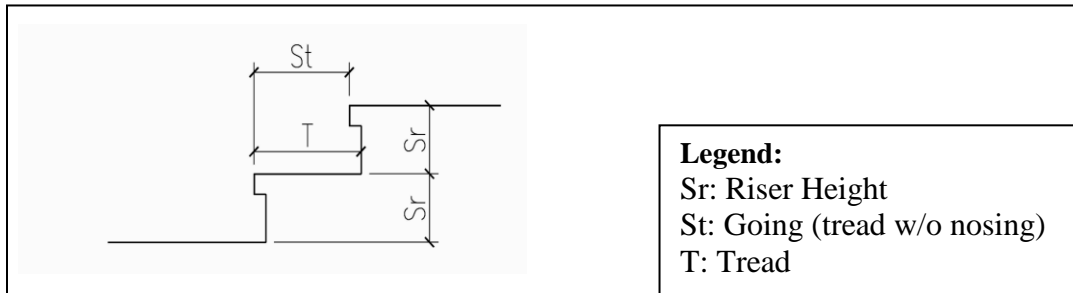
Schematic diagram of staircase section shows step dimensions
